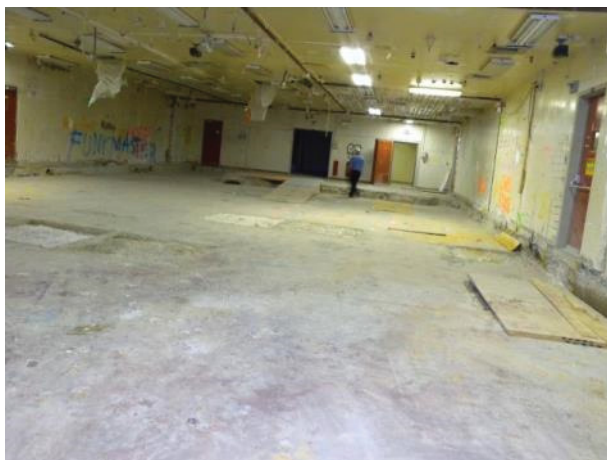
T Bldg. Rooms 39-44, 48-50 View C
